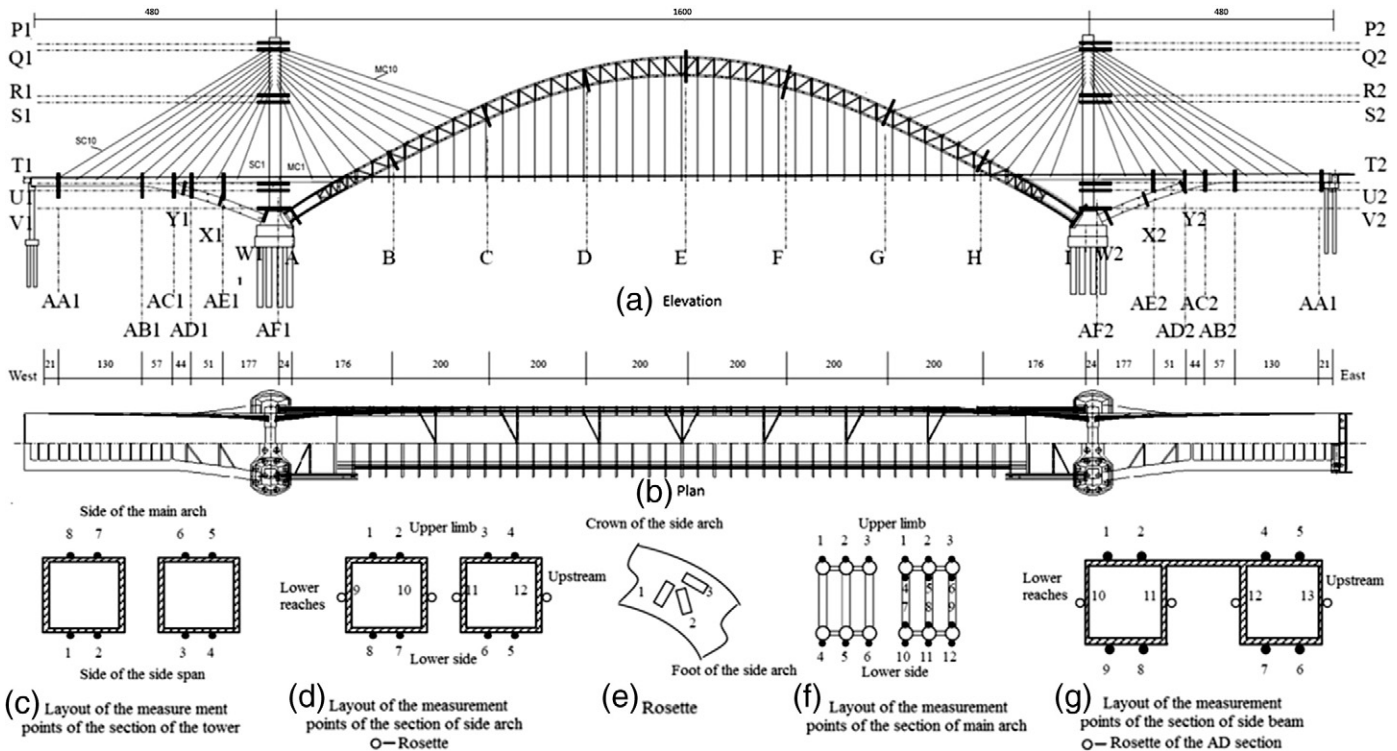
Layout of the model cable-arch bridge, cross sections and measured points. The upper and lower parts in (b) show the vertical projections of the half bridge from top view (top to bottom) and from bottom view (bottom to top), respectively.
